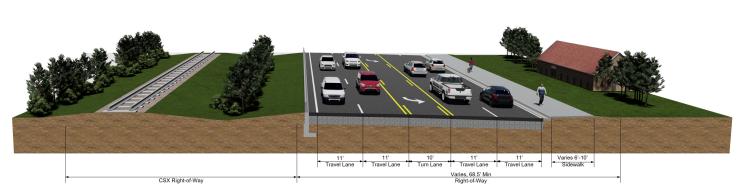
Design Concept Typical Section (US 17 from New Berlin Road to Airport Center Drive)
